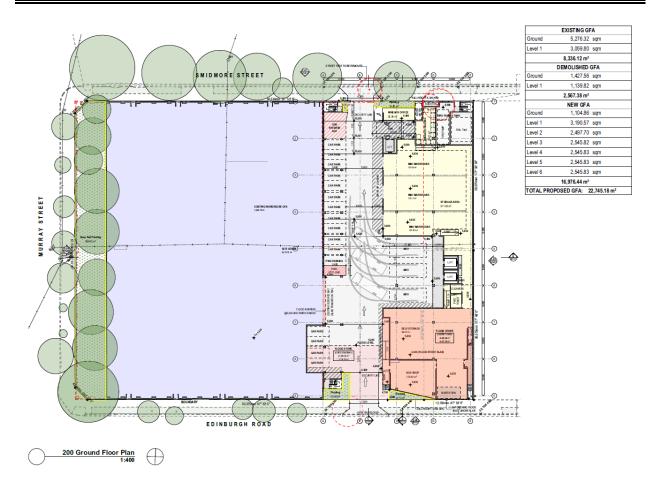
Concept Ground Floor Plan - Indicating deep soil area along western boundary
